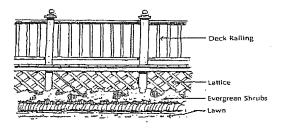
Deck Foundation/Perimeter Planting
